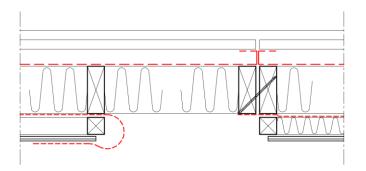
Existing Derome Villa Anneberg: Wall panel assembly: Step 1
